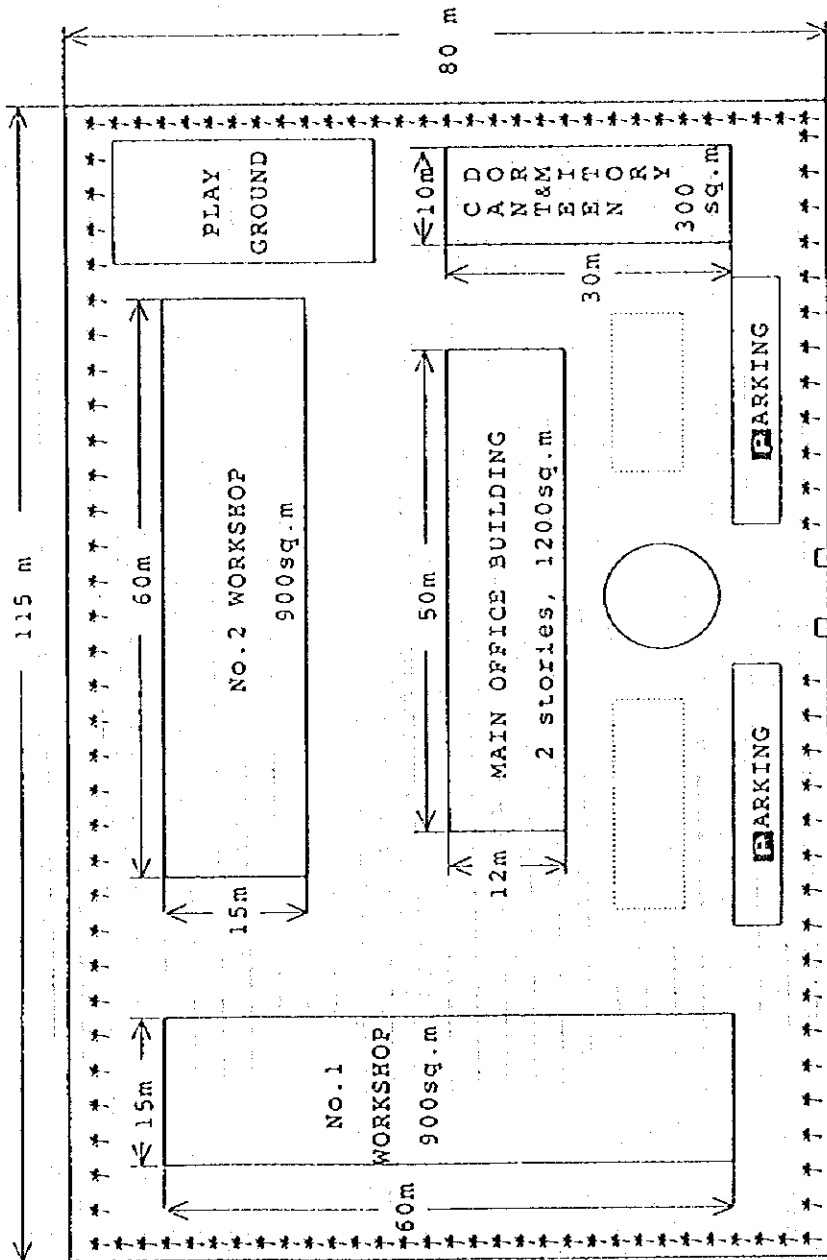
BUILDING ARRANGEMENT OF THE CENTER
